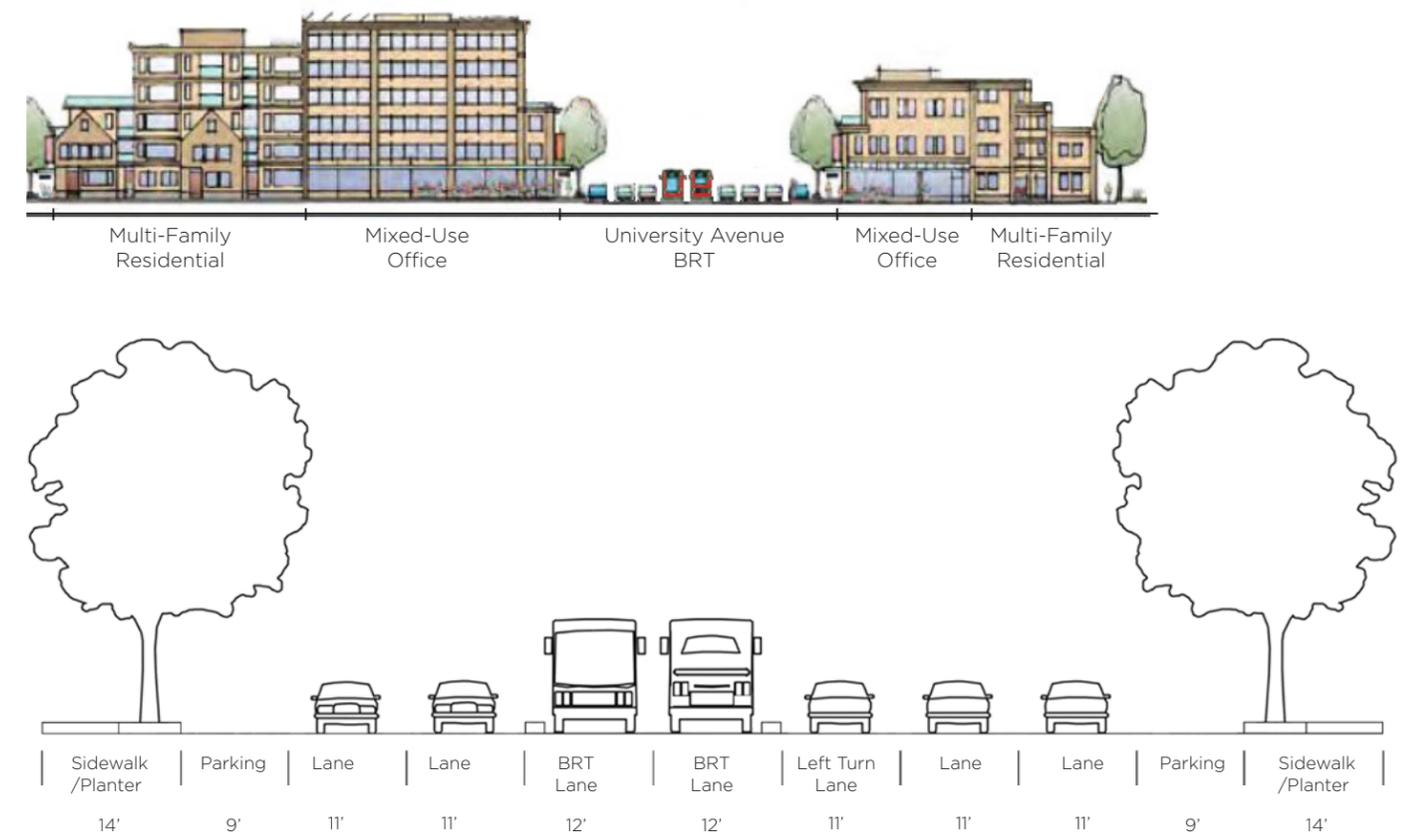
University Avenue illustrative and schematic street sections (facing north)
